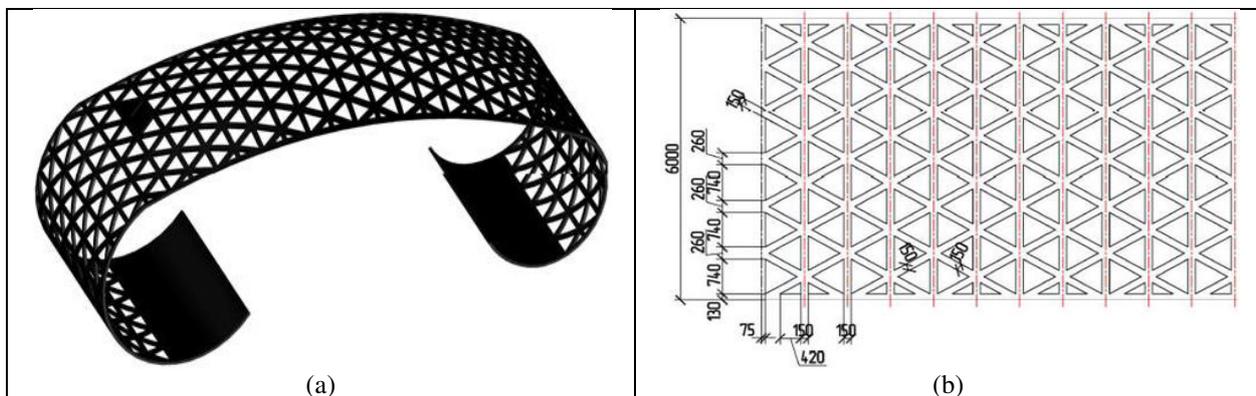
Layout liners and the shape of the internal edges of the structure: (a) lightweight part of the structure; (b) liner layout fragment.
